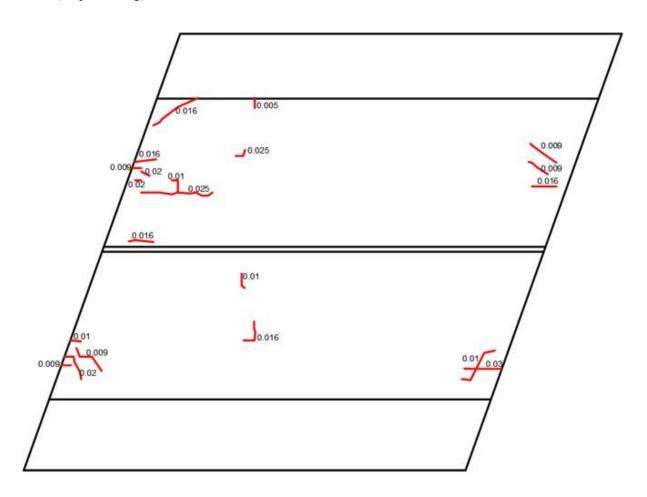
Bridge B67-099 crack map (crack widths in inches noted next to each crack).
